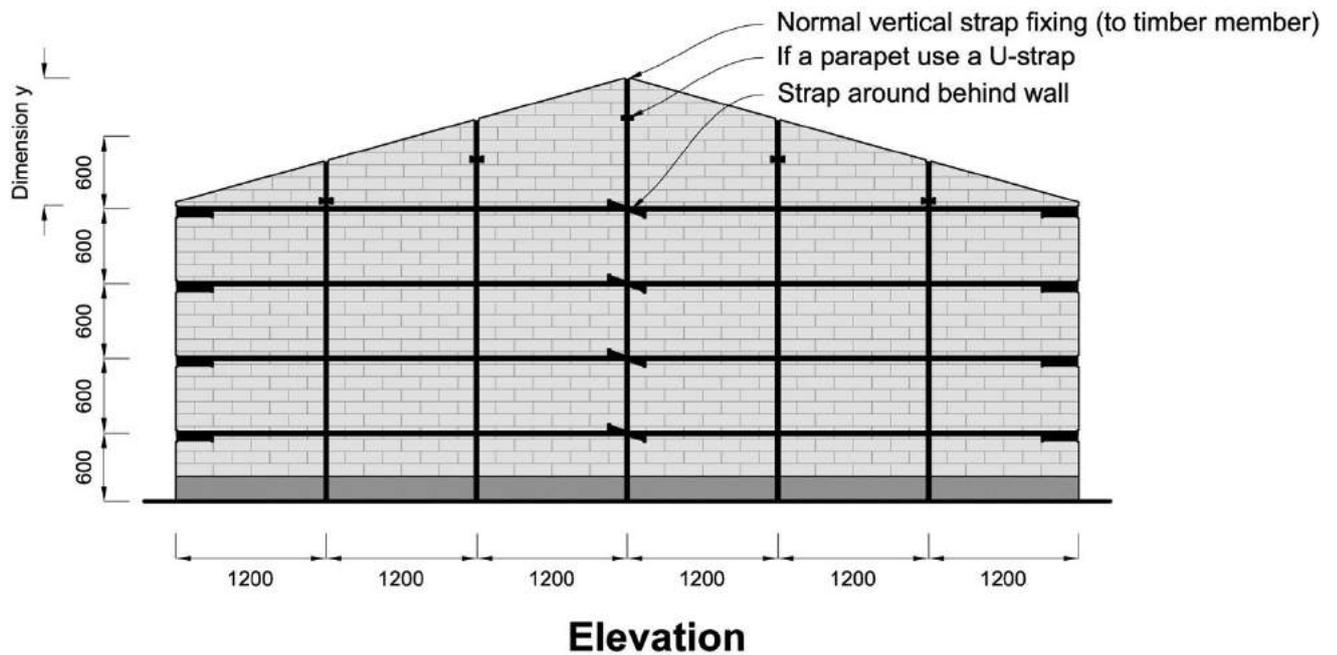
A gable and a parapet wall. There is a wall behind the middle of the gable wall. If 'y' is greater than 1000 mm, use two top horizontal straps side by side along the return wall to tie it to the gable wall.
